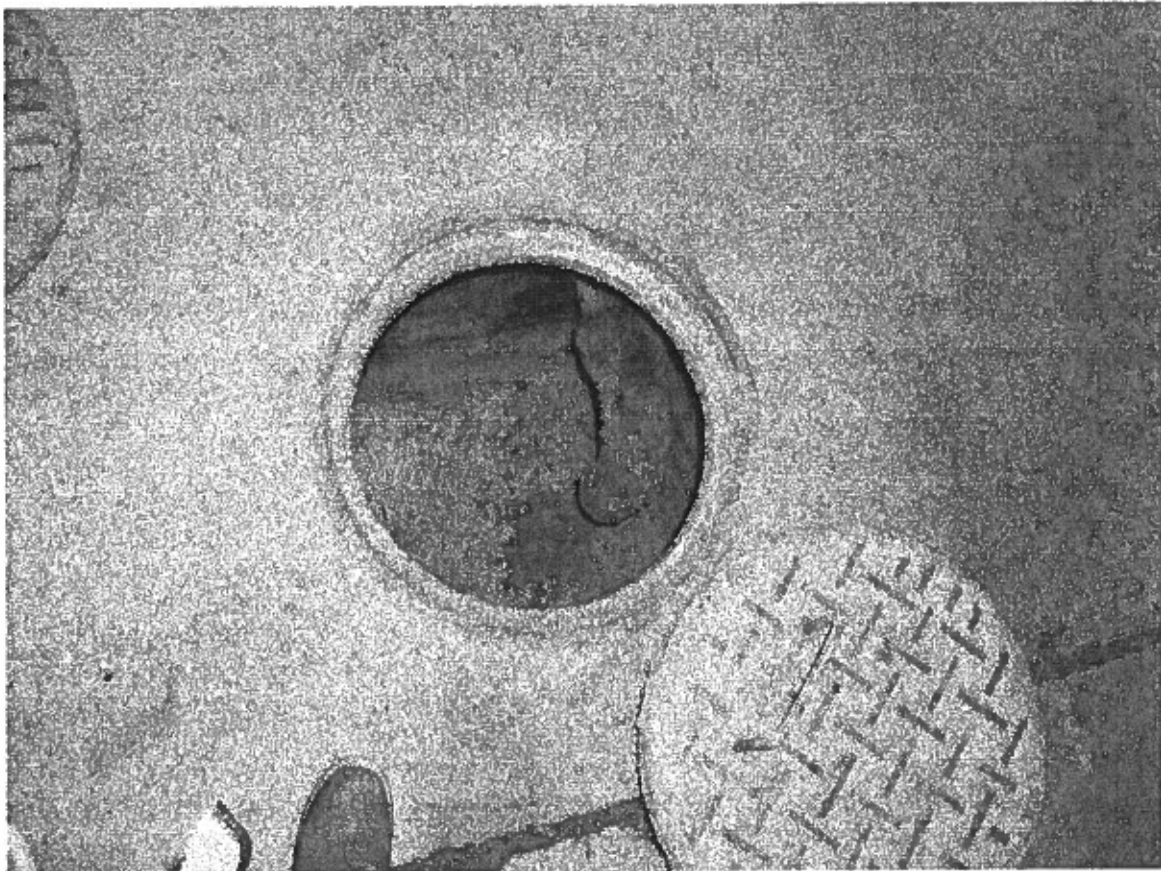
View into oil/water separator/sediment trap in South bay of warehouse/shop building.
